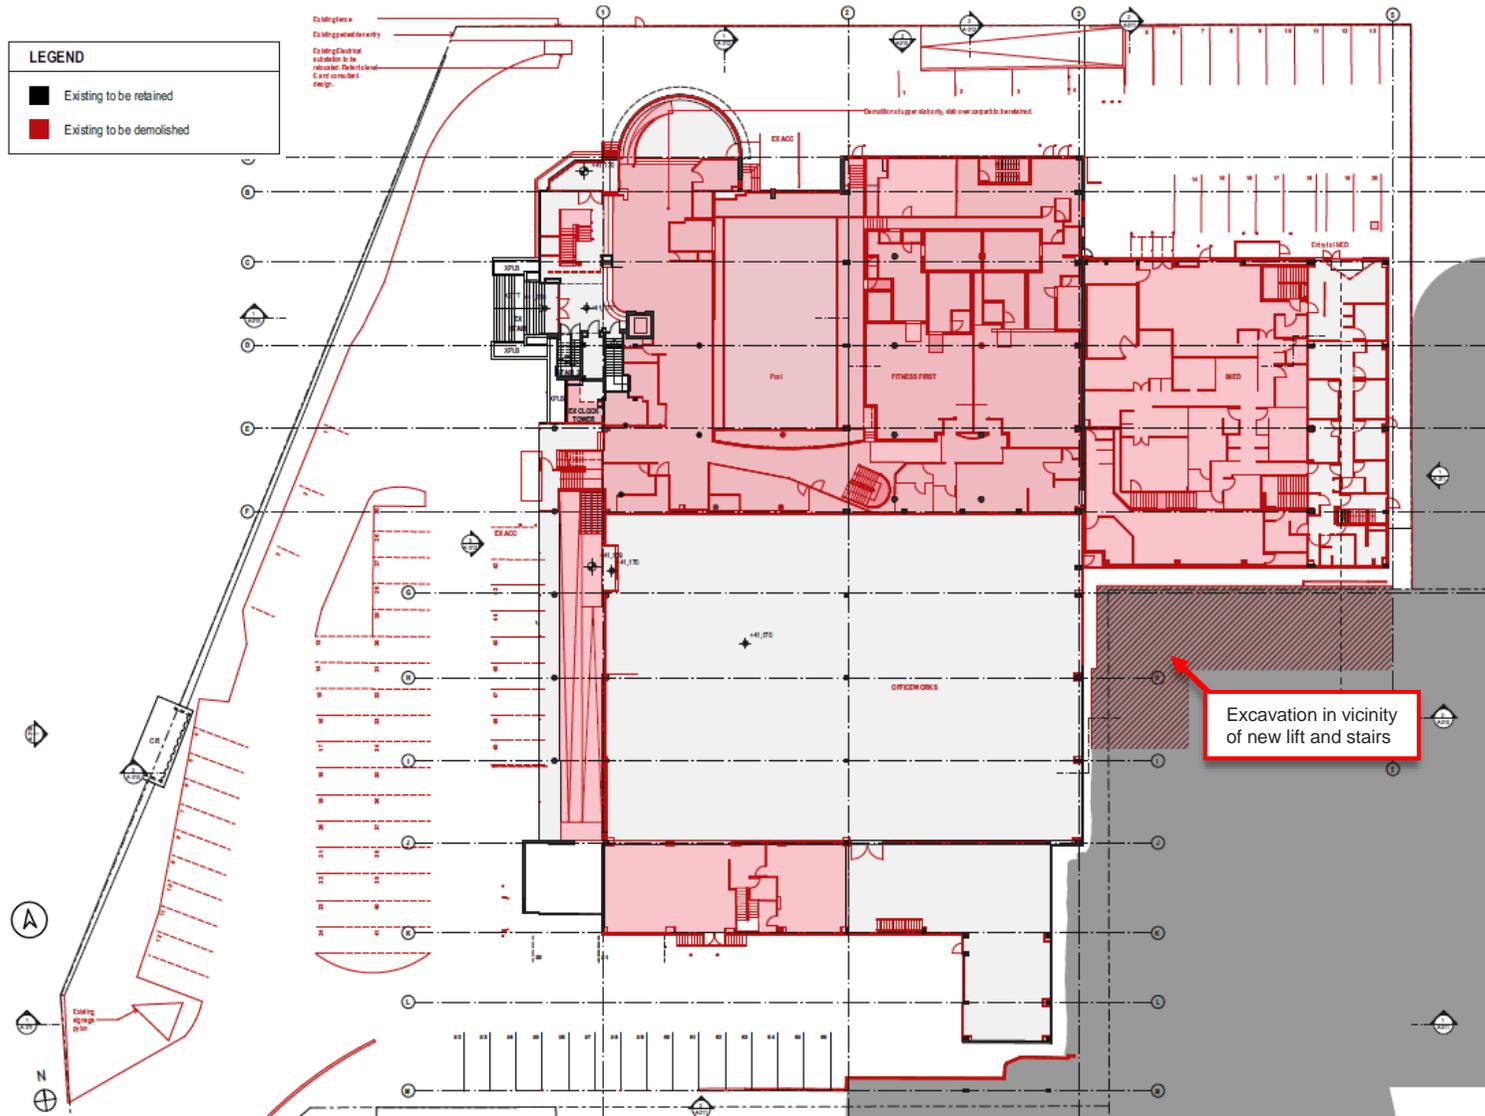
Extent of proposed excavations at Level 1, 800 Pittwater Road (Source: Level 1 Demolition Plan\_800, A-031, Rev A, 29/10/2019, Tonkin Sulaikha Greer Architects)
